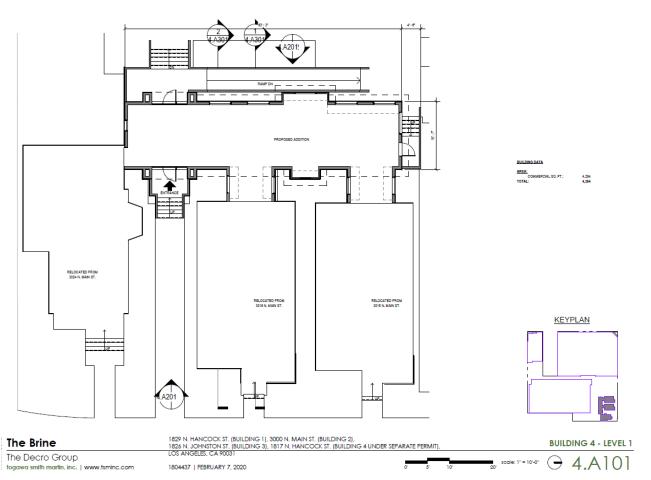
Schematic/Design Development, TSM Architects; Site Plan February 2020
